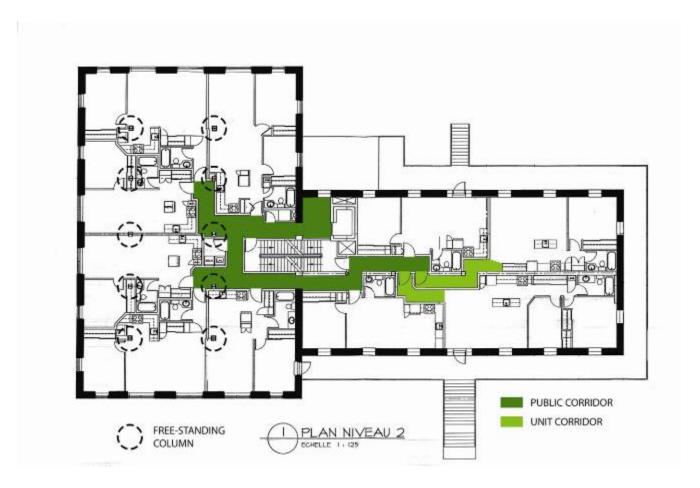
Second-level floor plan of the TC showing the unit layouts. Note the labyrinthine corridor system. Originally, the convent would have featured a central corridor serving rooms on either side, or one large open space on the floor. Also note the free-standing columns in the units in the building on the left. Schematic plans derived from those provided courtesy of the property manager based on the architect's plans of the building.
